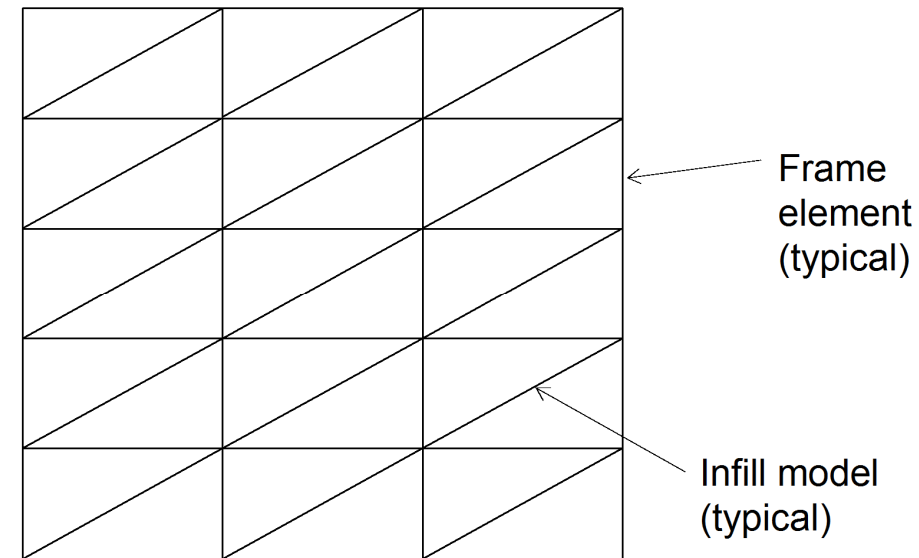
Elevation of column line B, showing arrangement of proposed infill models within building frame.
